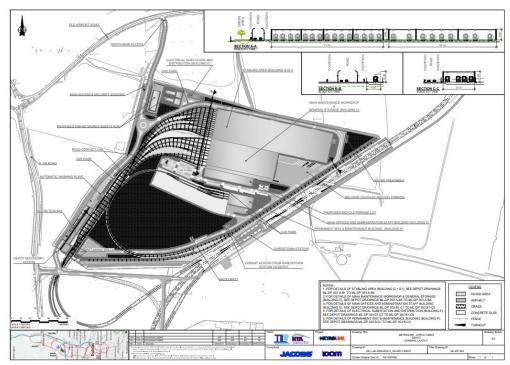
Proposed Site Layout Plan for the Dardistown Metrolink Station and Depot (Drawing Number ML-DP 303 of Metrolink Railway Order Application)
